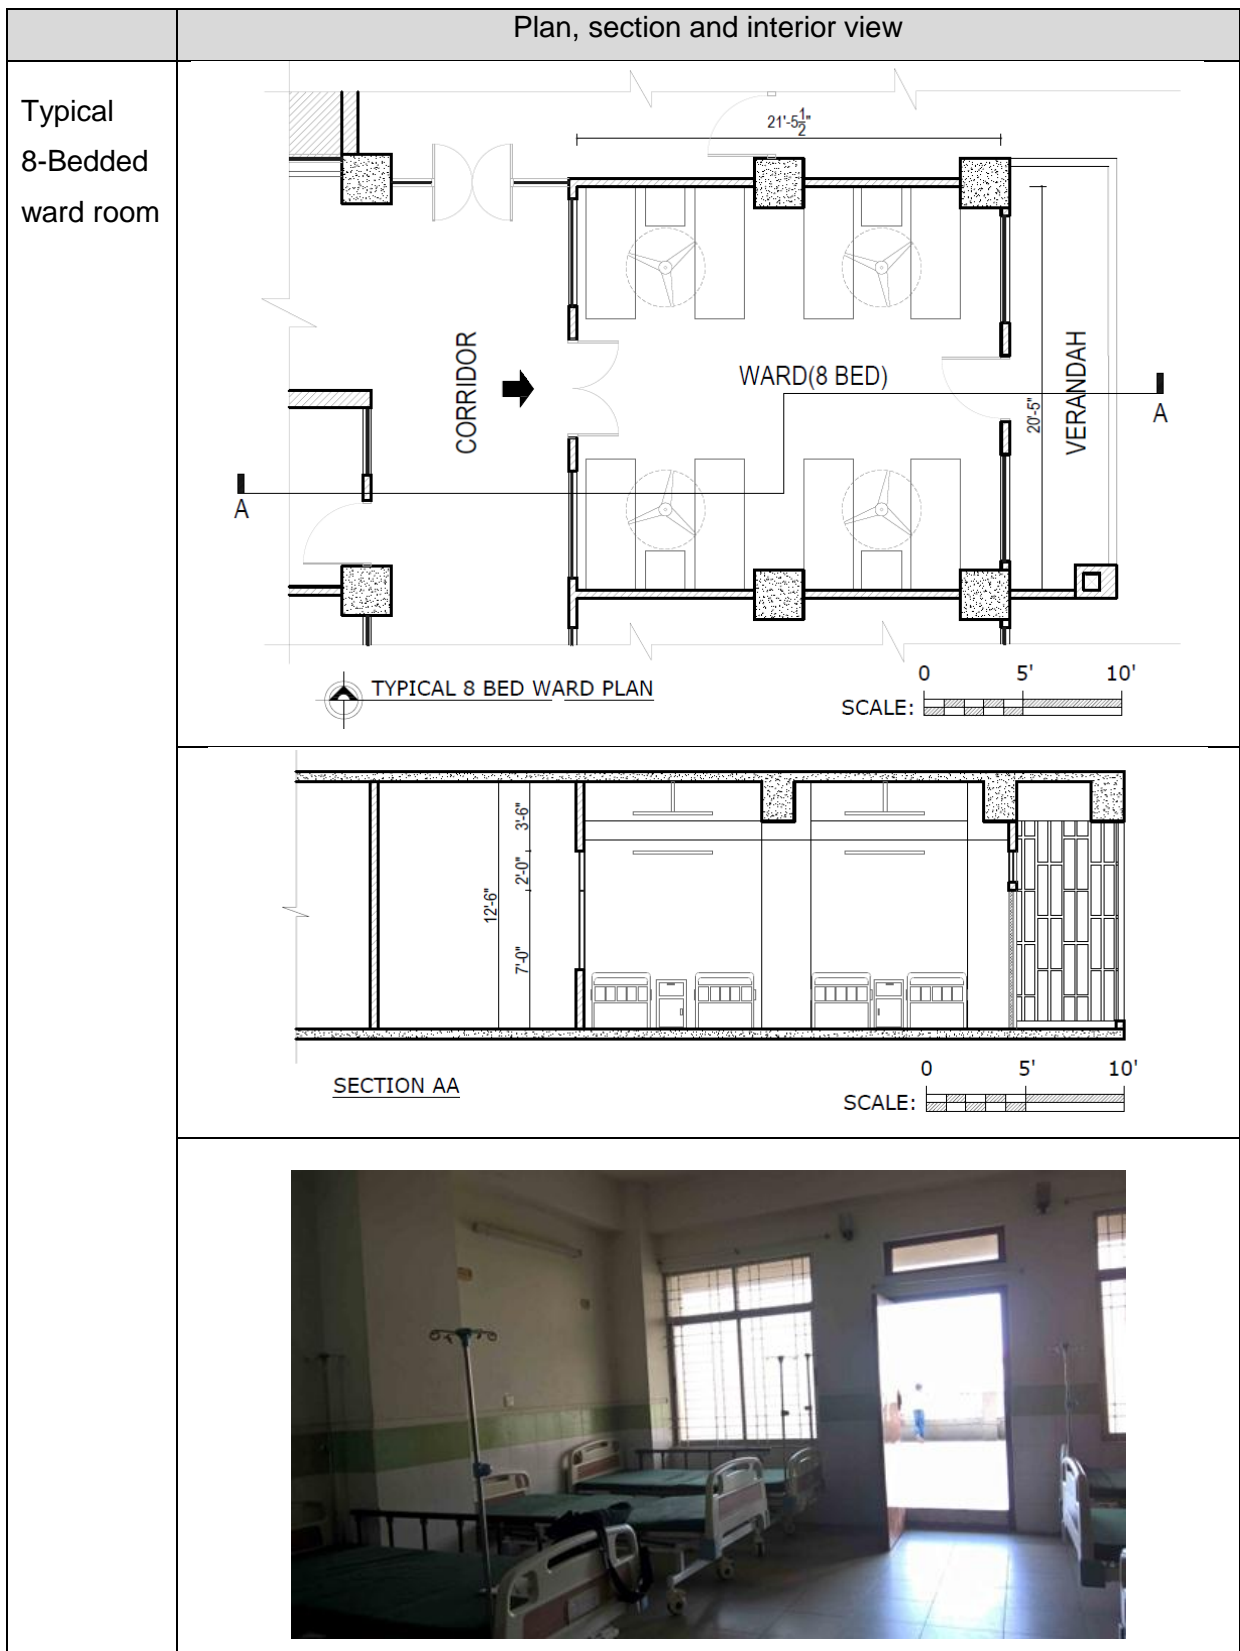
Plan, section and interior view of ward rooms with 8 beds
